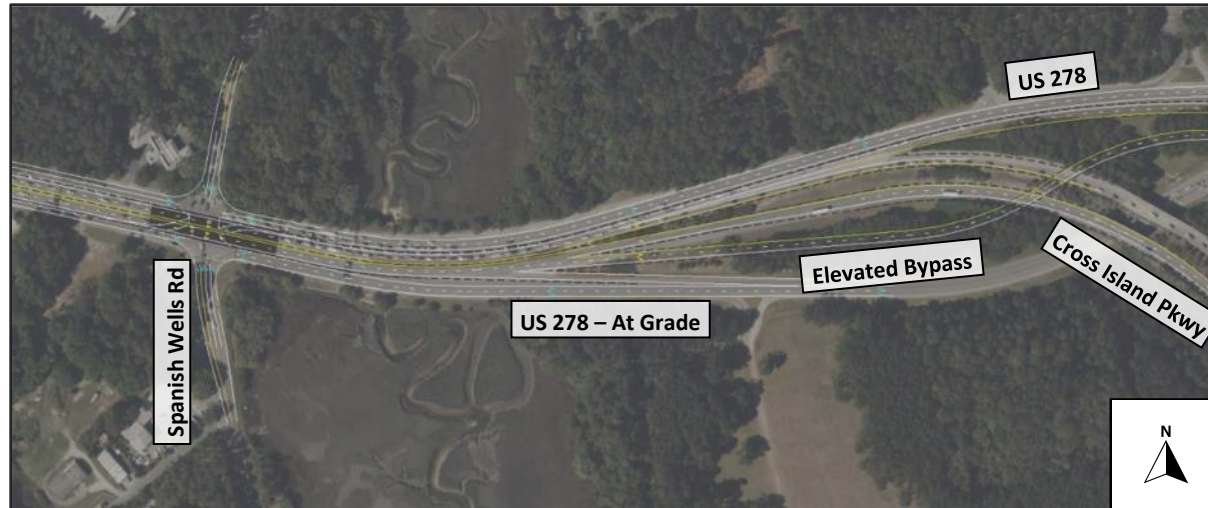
EXAMPLE OF ELEVATED BYPASS - 03
